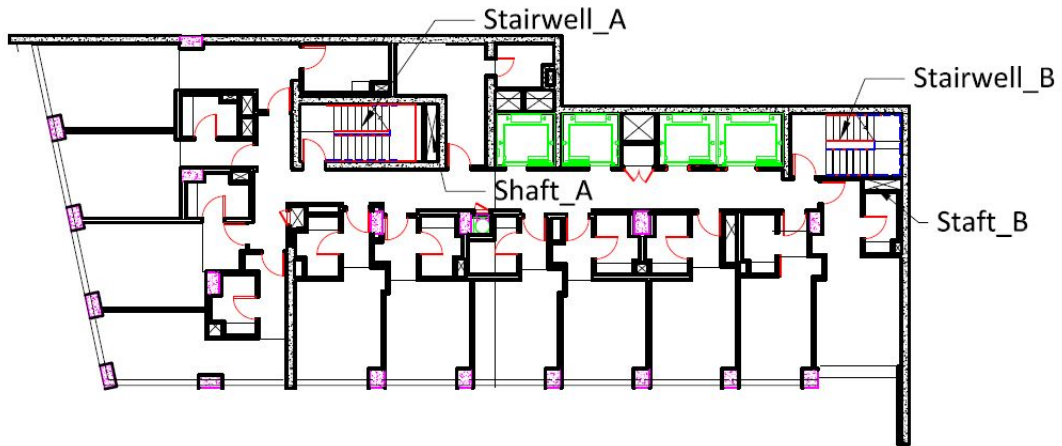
2nd floor layout has 12 bedrooms and 12 bathrooms
